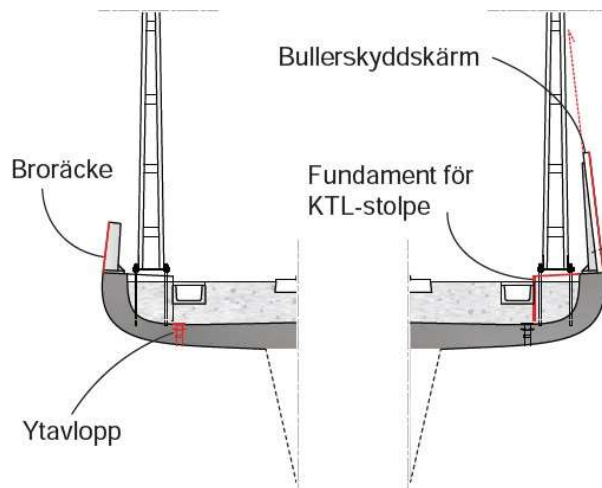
6 Cross-section through a railway bridge and its components.
